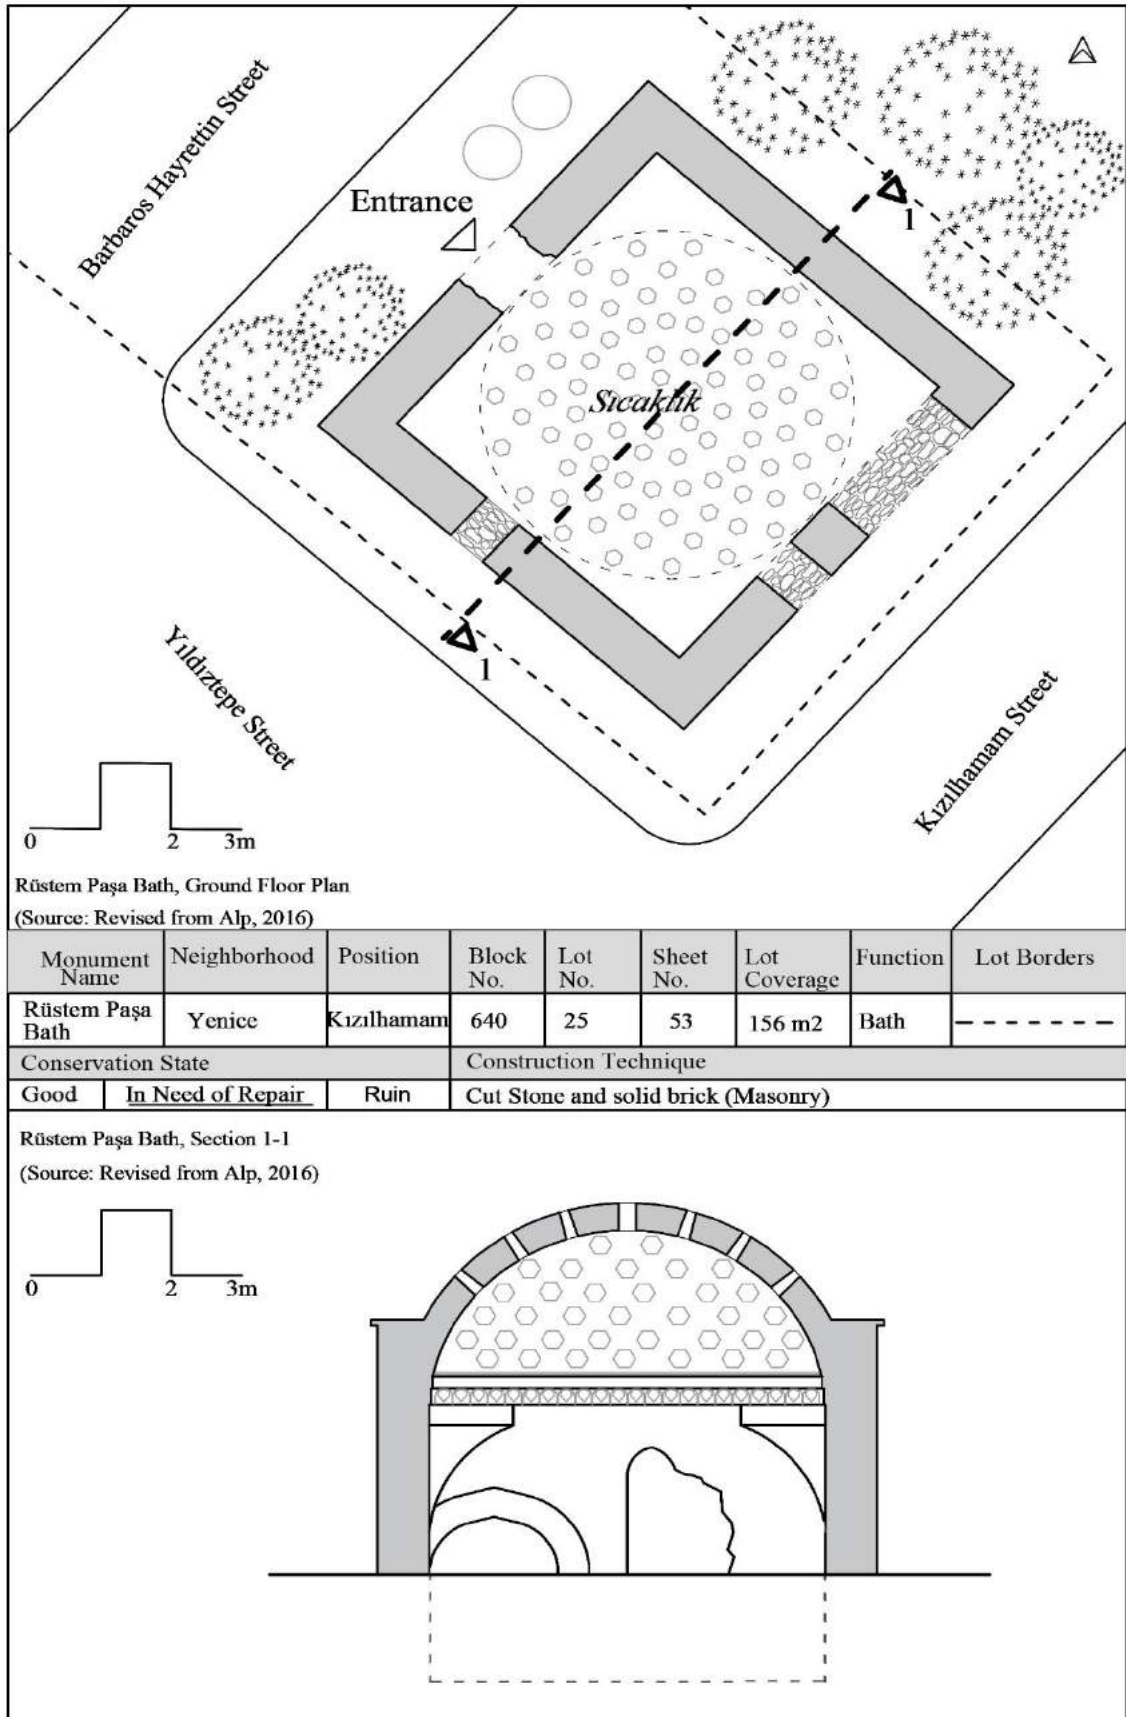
Ground floor plan and section, Rüstem Paşa Bath
